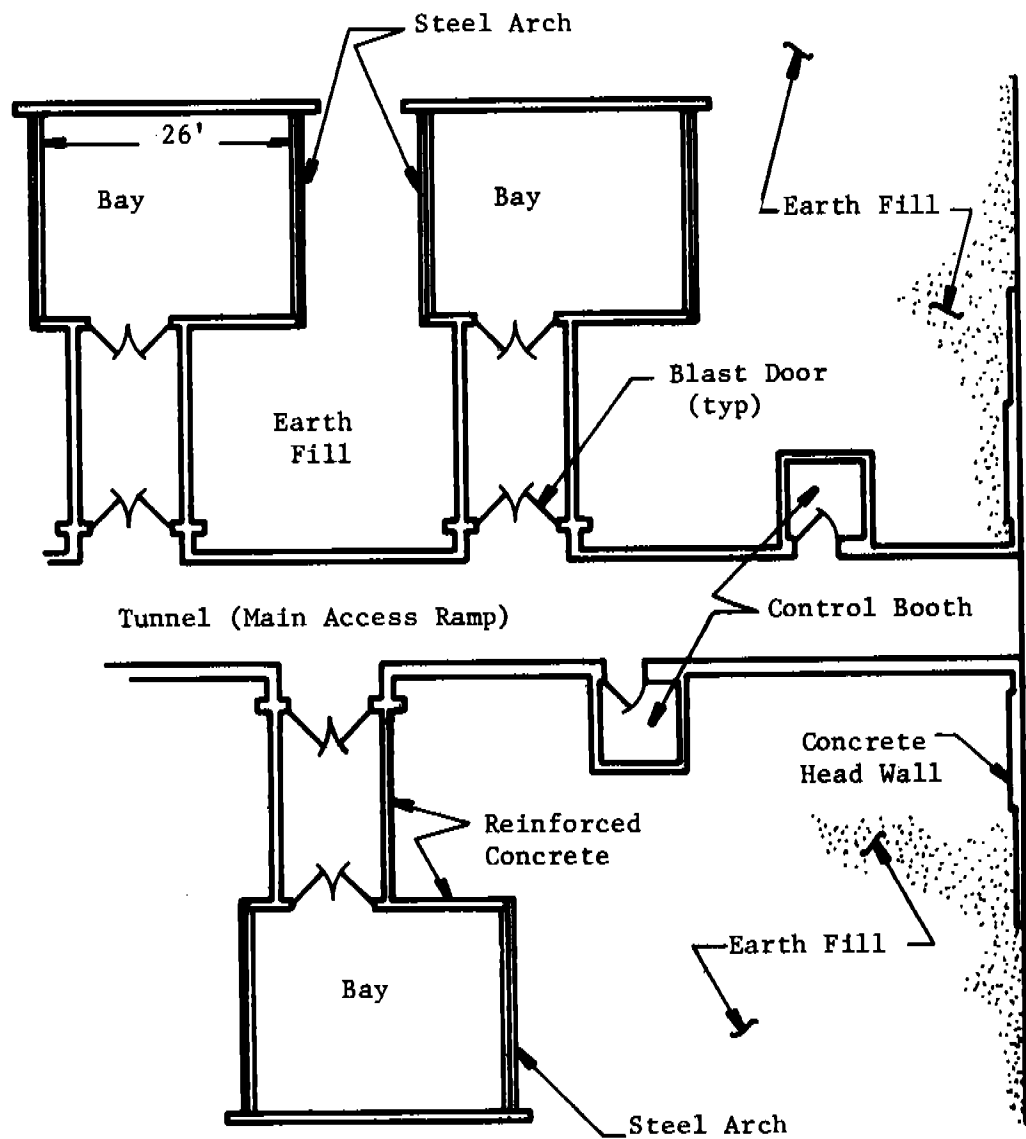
Plan View Of Buried Tunnels Connected To Chambers, Building 12-60
